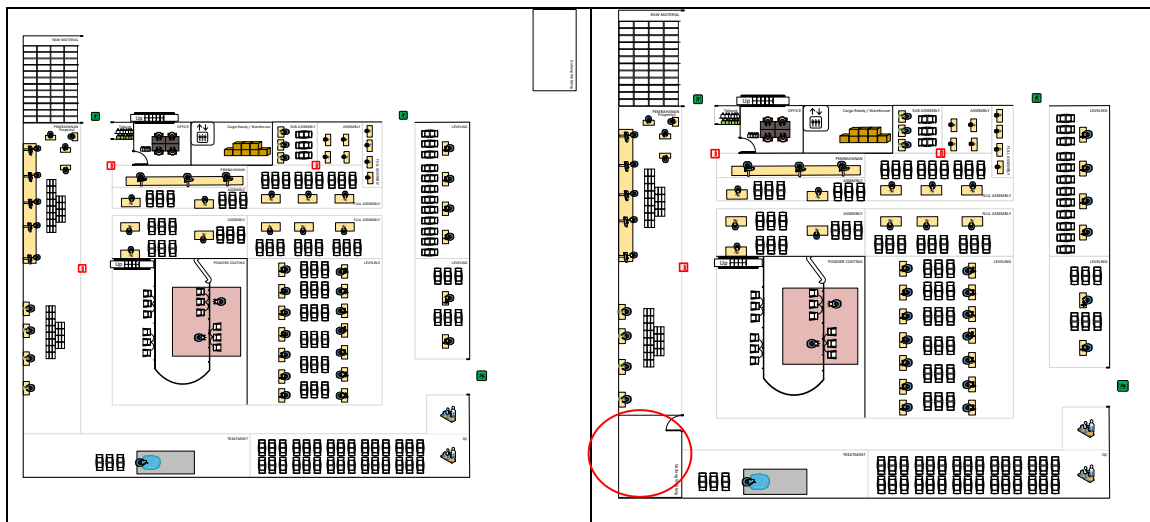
Current (left) and Proposed (right) Layout Floor 1
